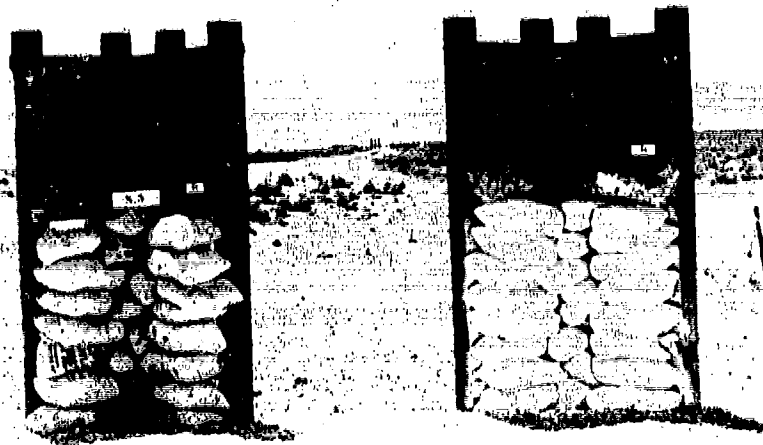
Wall-corner Sections at 10,000-ft After Shot 3.
